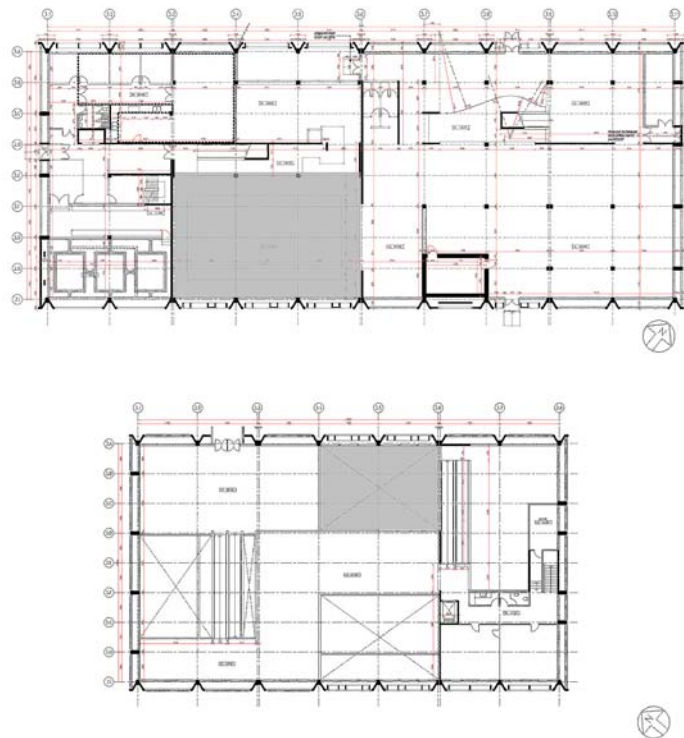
Floor plan of Building 3 (upper) and Building 4 (lower)
